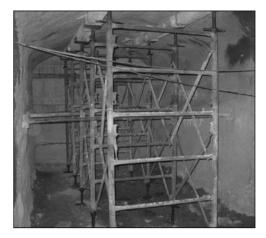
Strut supported access tunnels, Echeverría Station, Line B.
